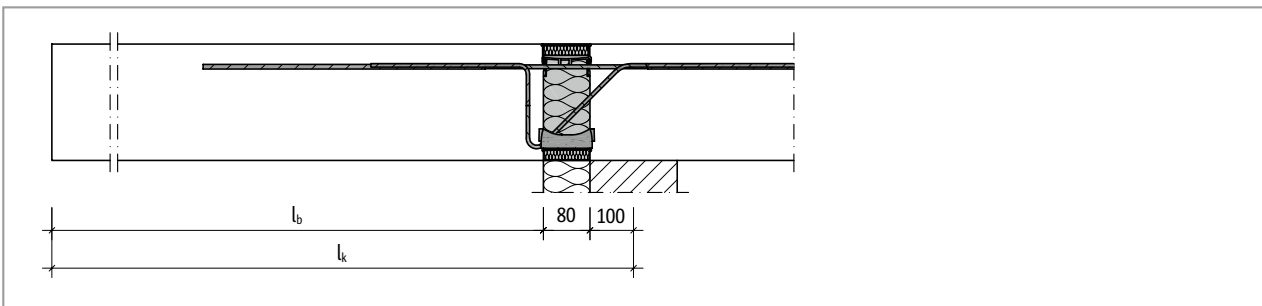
Schöck Isokorb® type K: System cantilever length (l_k) for design and geometric cantilever length (l_b)
